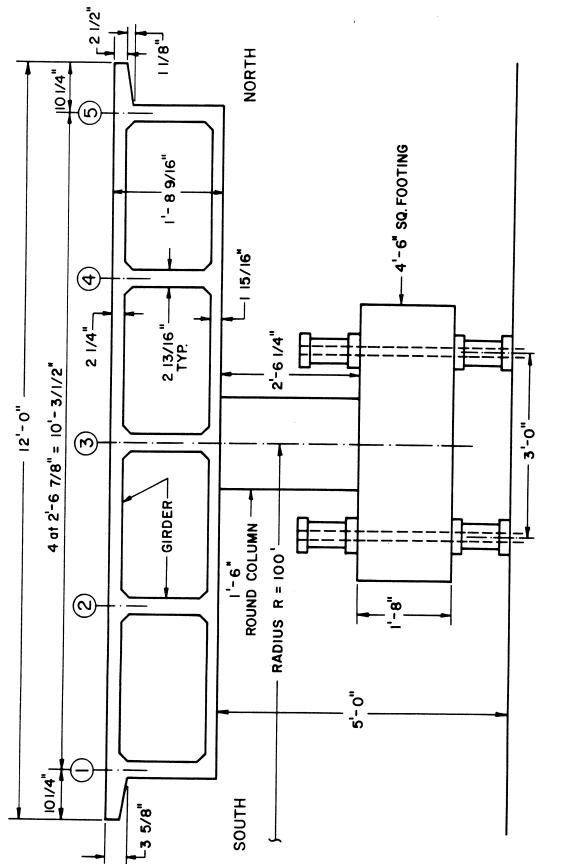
TYPICAL SECTION OF BOX GIRDER BRIDGE MODEL
